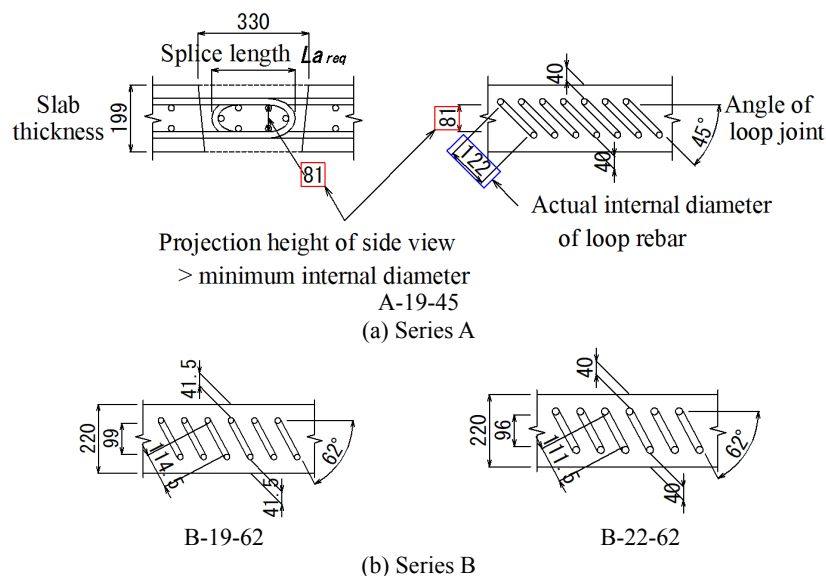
Setting the internal diameter of loop rebar (unit: mm).
